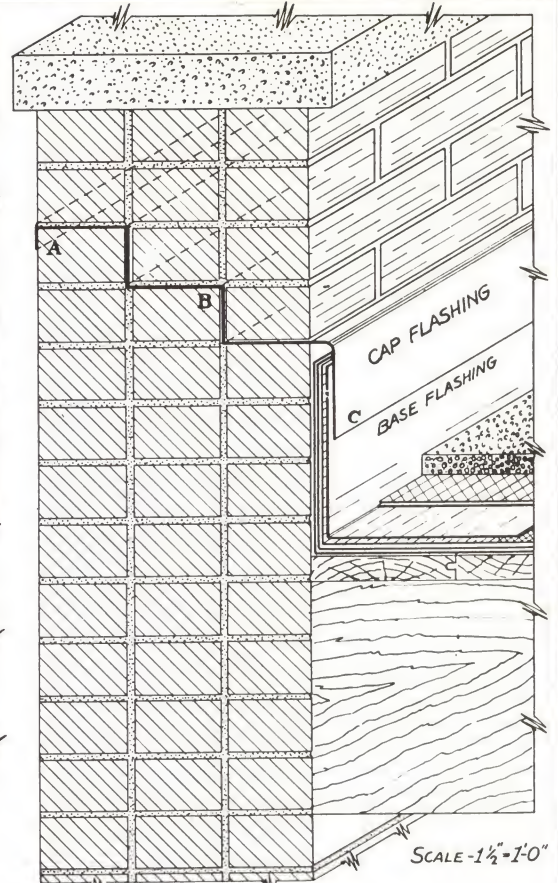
CAP FLASHING OVER ENTIRE WALL
